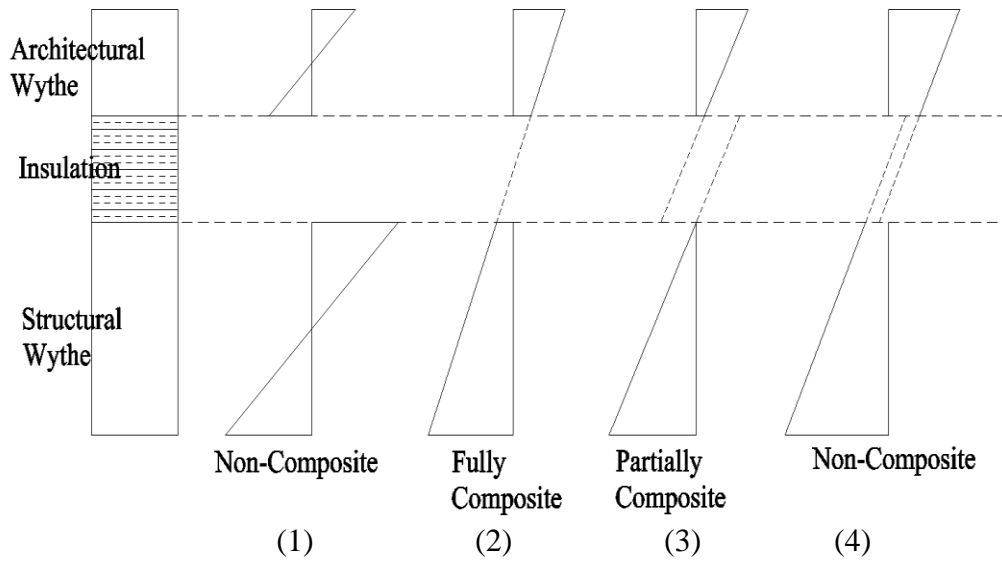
Sectional Strain Profiles for Tilt-up and Precast Panels
